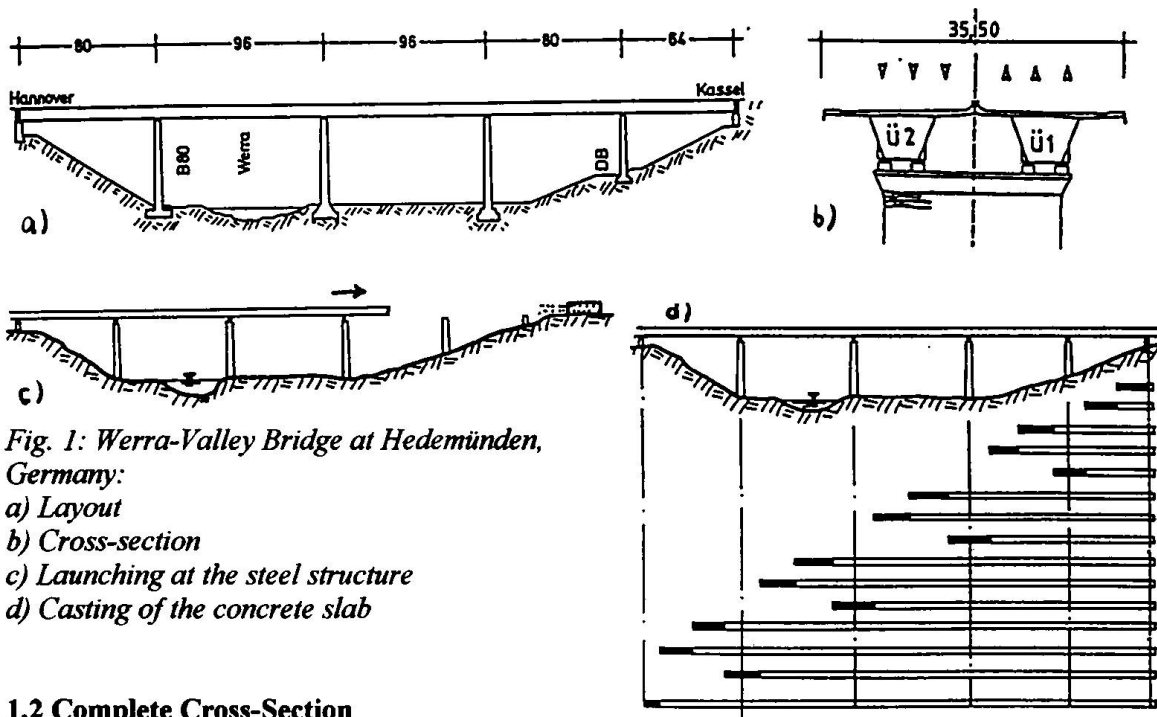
Werra-Valley Bridge at Hedemünden, Germany:
